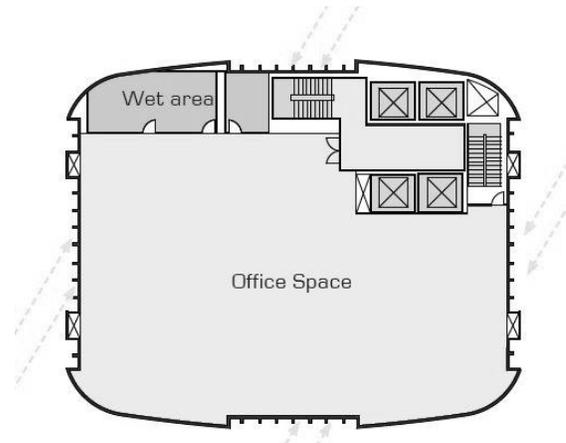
Typical floor plan. Source: Planning Systems Services (Author 2016)
